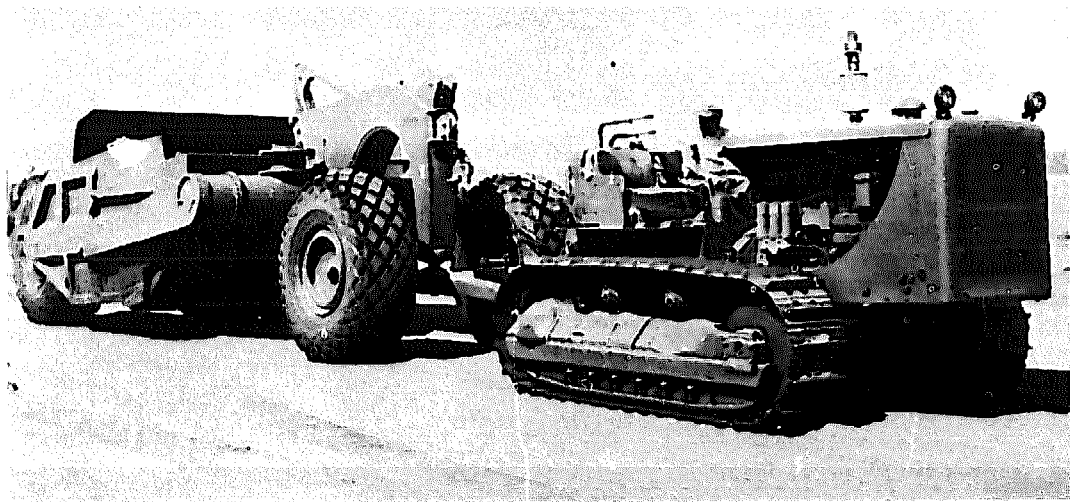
Four-wheel rubber-tired tractor and two-wheel bucket scraper being pushed by crawler tractor with blade during loading operation.
